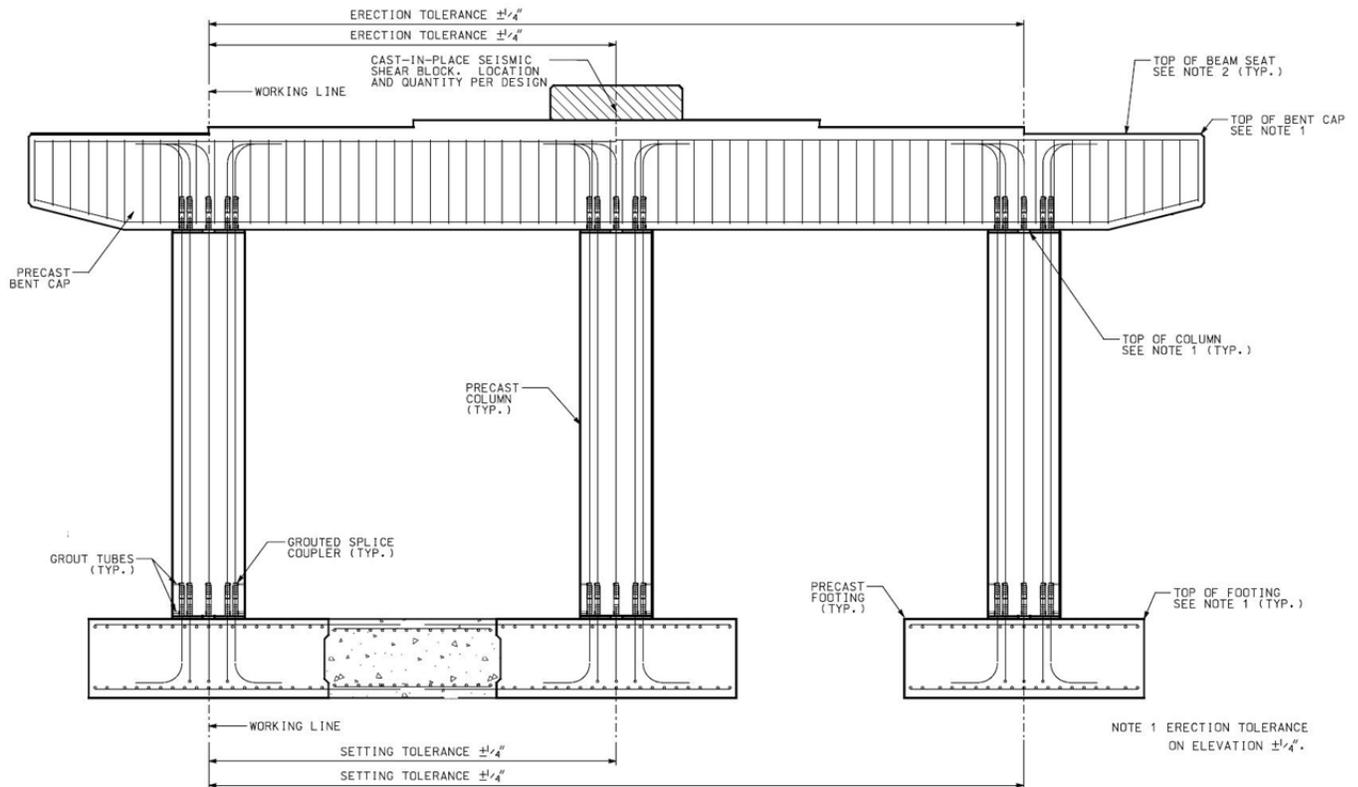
Example of Element Erection Tolerance Details (source: PCI Northeast)
